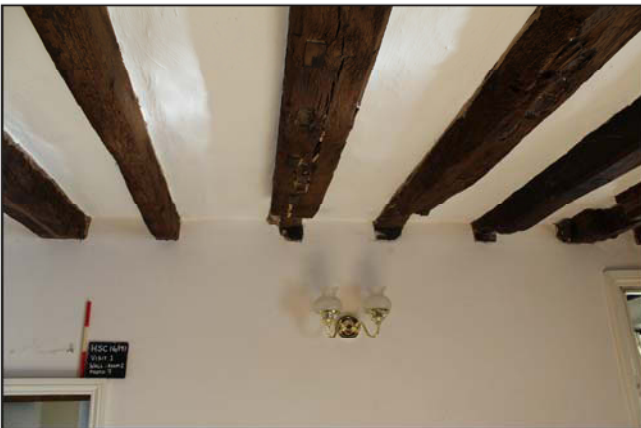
Top of the wall showing the joists, looking North, Scales: 0.3m.
